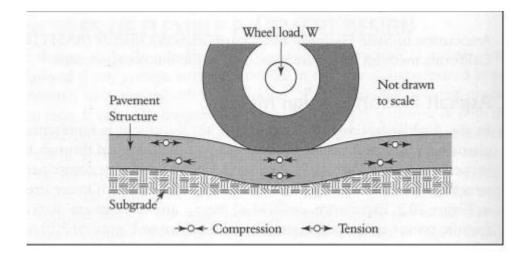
Schematic of Tensile and Compressive Stresses in Pavement Structure
